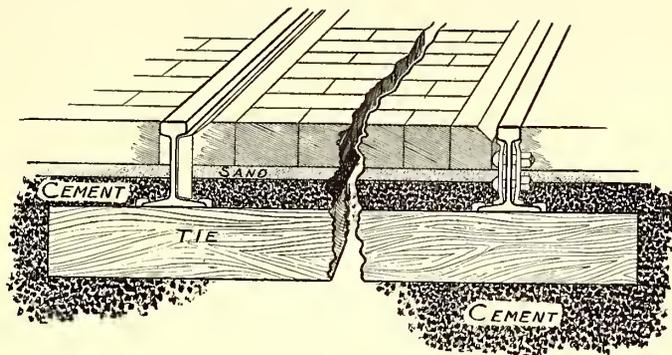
CROSS-SECTION OF T-RAIL PAVED-STREET CONSTRUCTION IN BATTLE CREEK, MICH.
